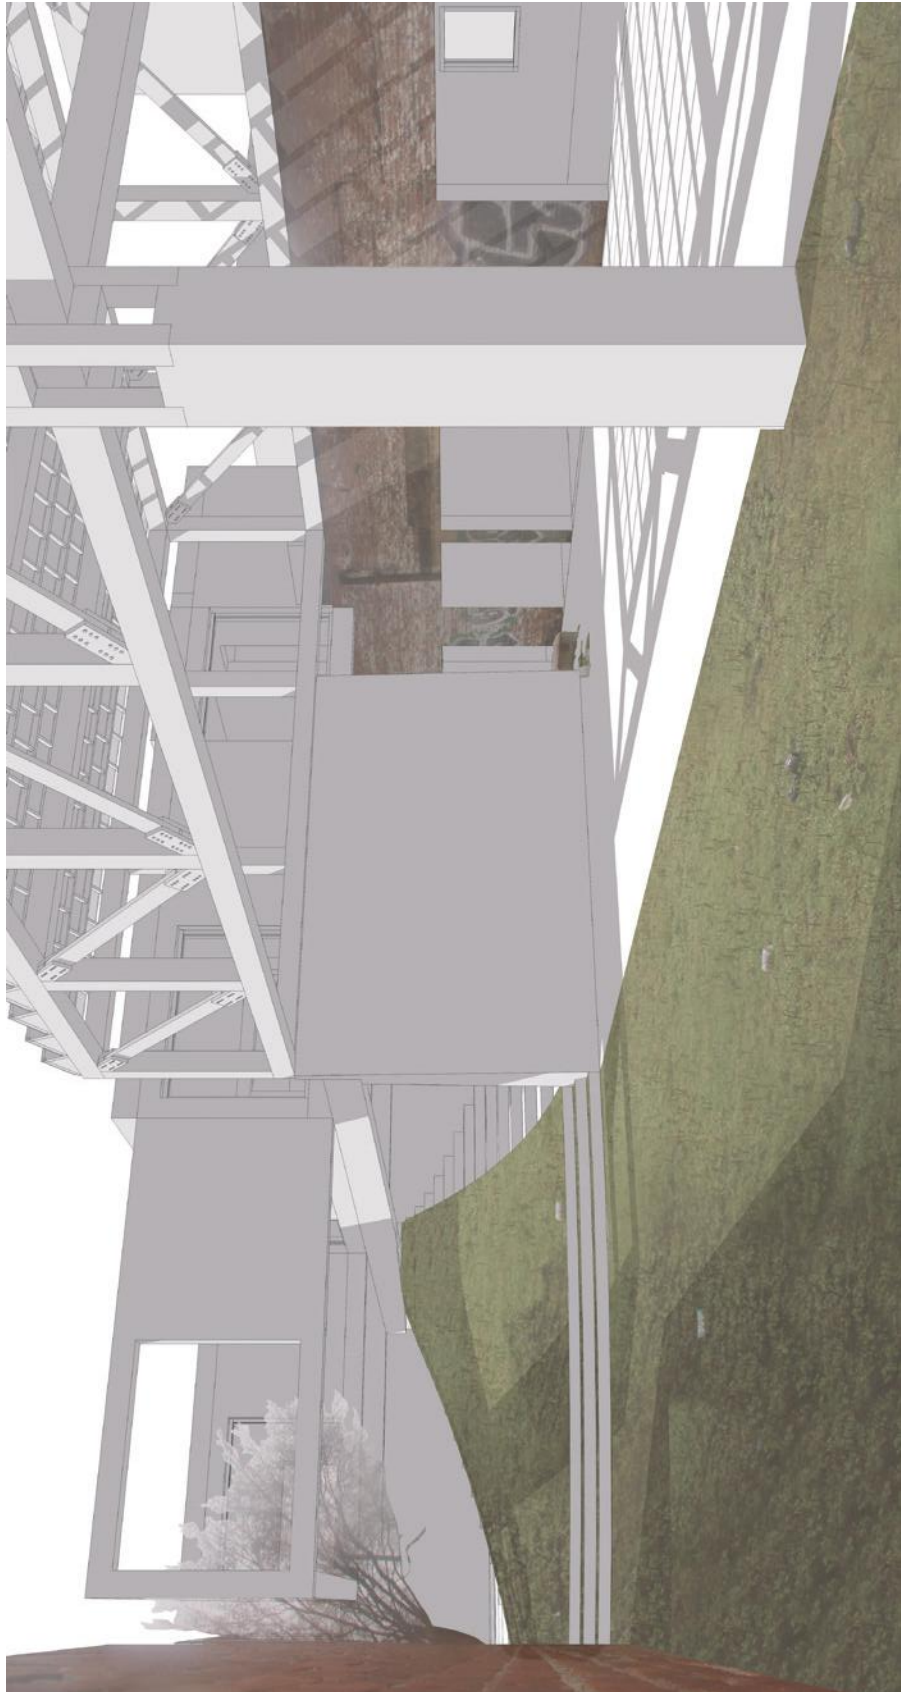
STREETVIEW AS BEFORE-AFTER COLLAGE - VIEW FROM KING STREET (2)
